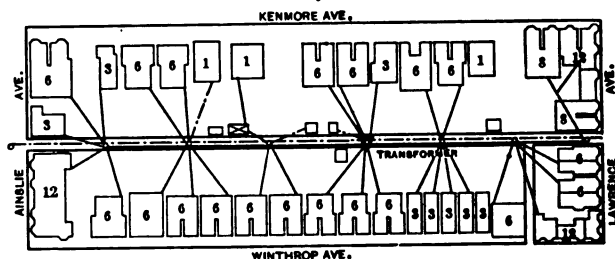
BLOCK OF APARTMENT BUILDINGS.
